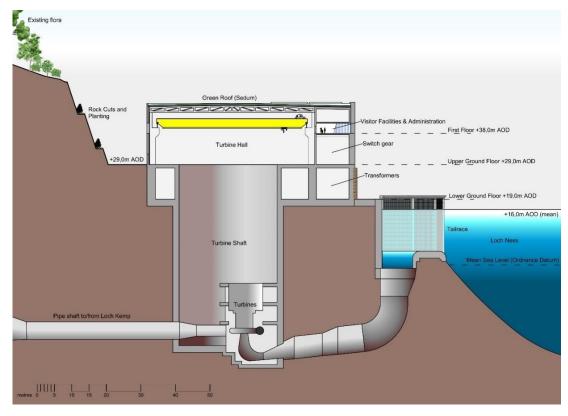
Indicative cross section through Surface Powerhouse Building, Turbine Hall and Turbine Shafts
